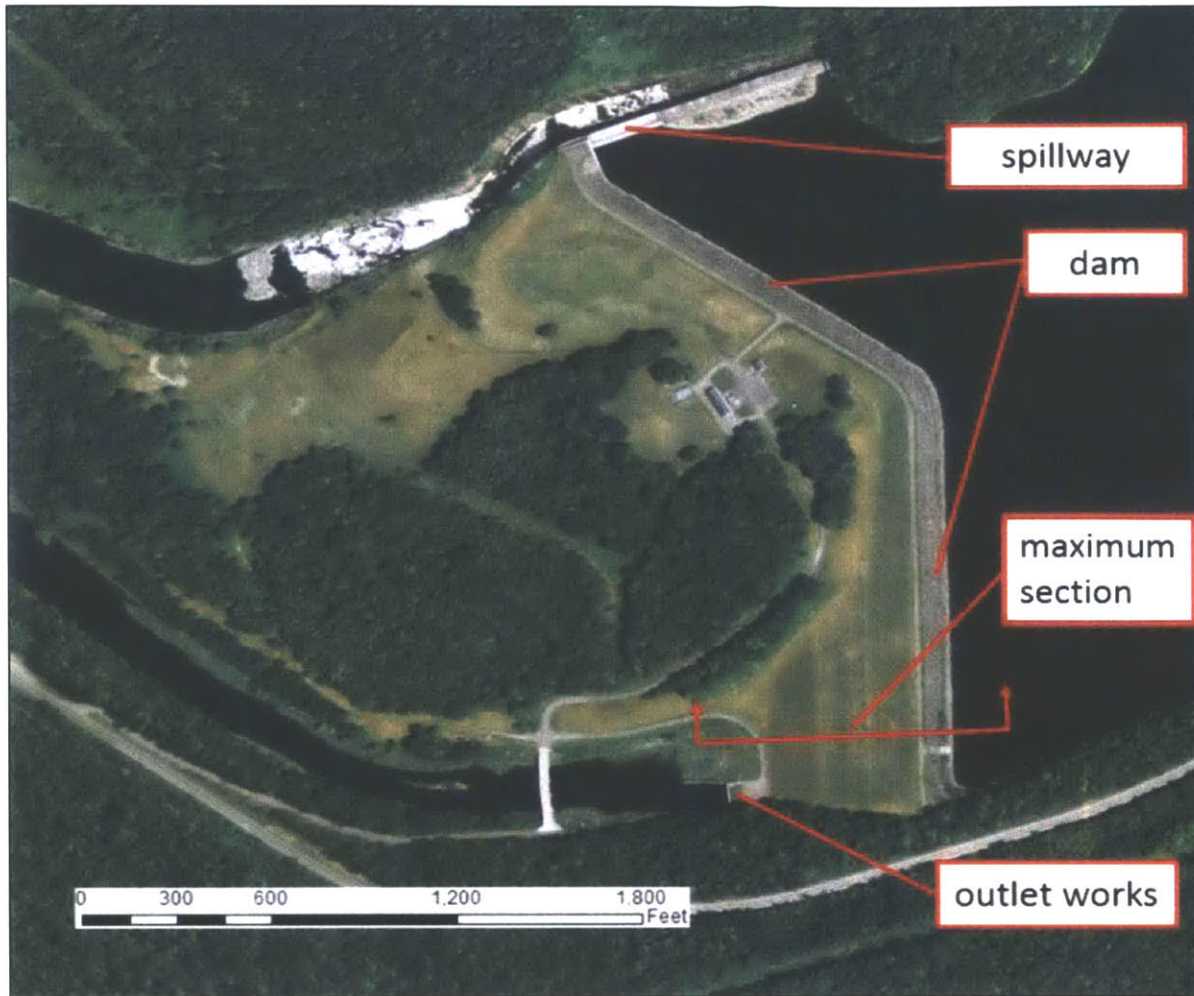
Aerial photo of CV dam and hydraulic structures.
